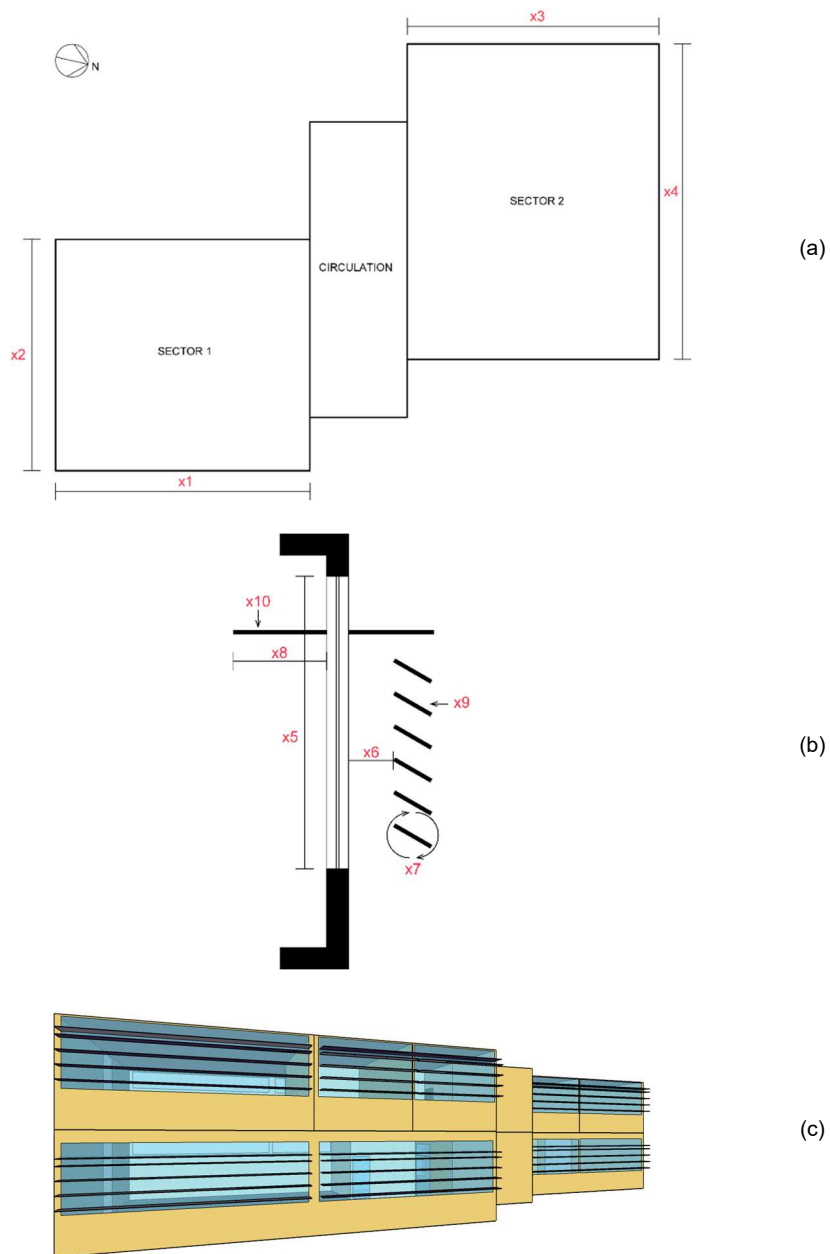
Schematic floor plan with the building's geometric parameters (a), a schematic section with shading devices and light shelves' parameters (b), and integration of shading devices in the main façade. Source: Adapted from Da Silva et al. (2018)
